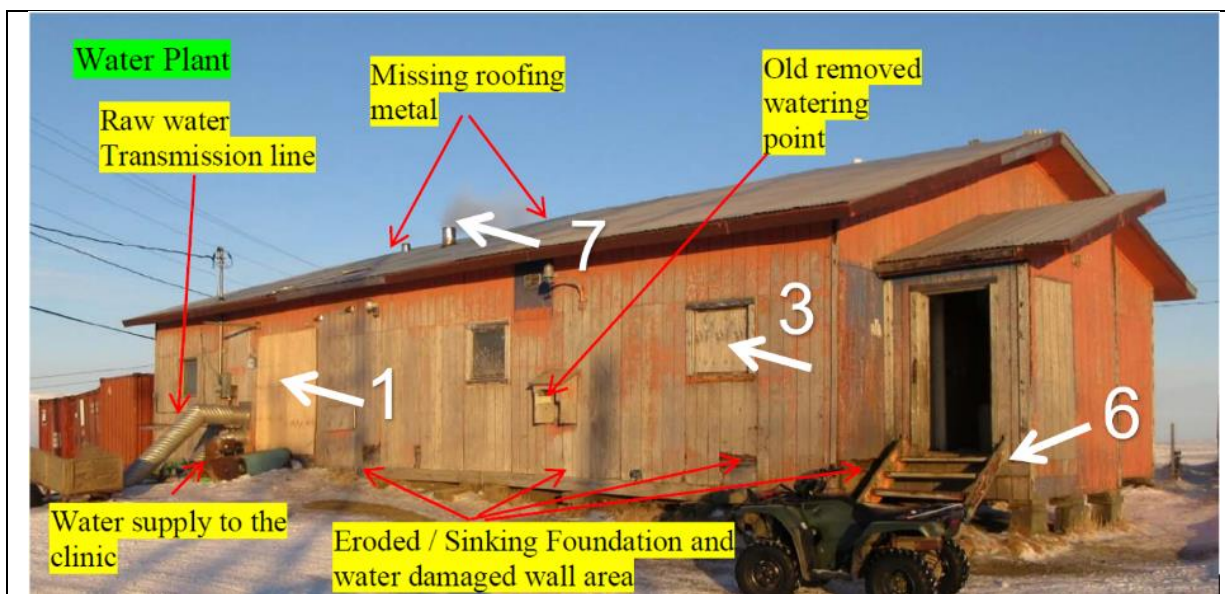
Exterior Condition of North East Side of Washeteria Building from 2017
